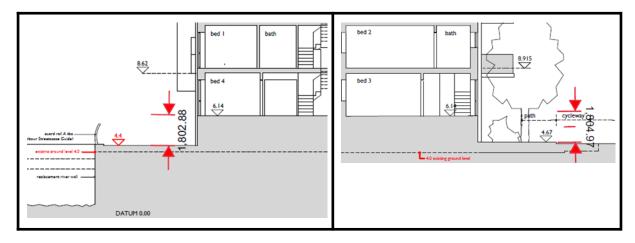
Ground Floor Rooms - Heights relative to public paths
